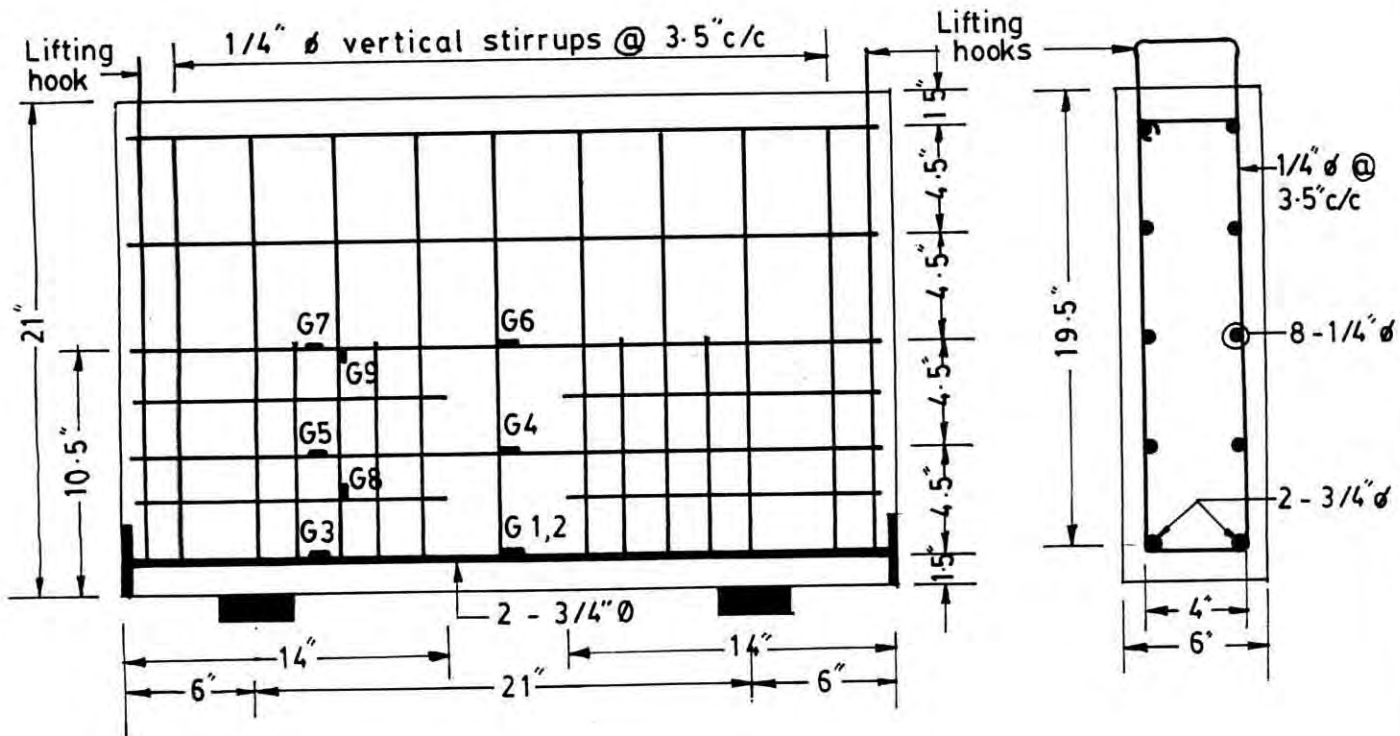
Reinforcement arrangement of beam DB-P2
